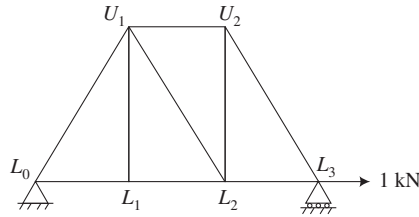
(b) Truss with unit horizontal force at L_3 .
